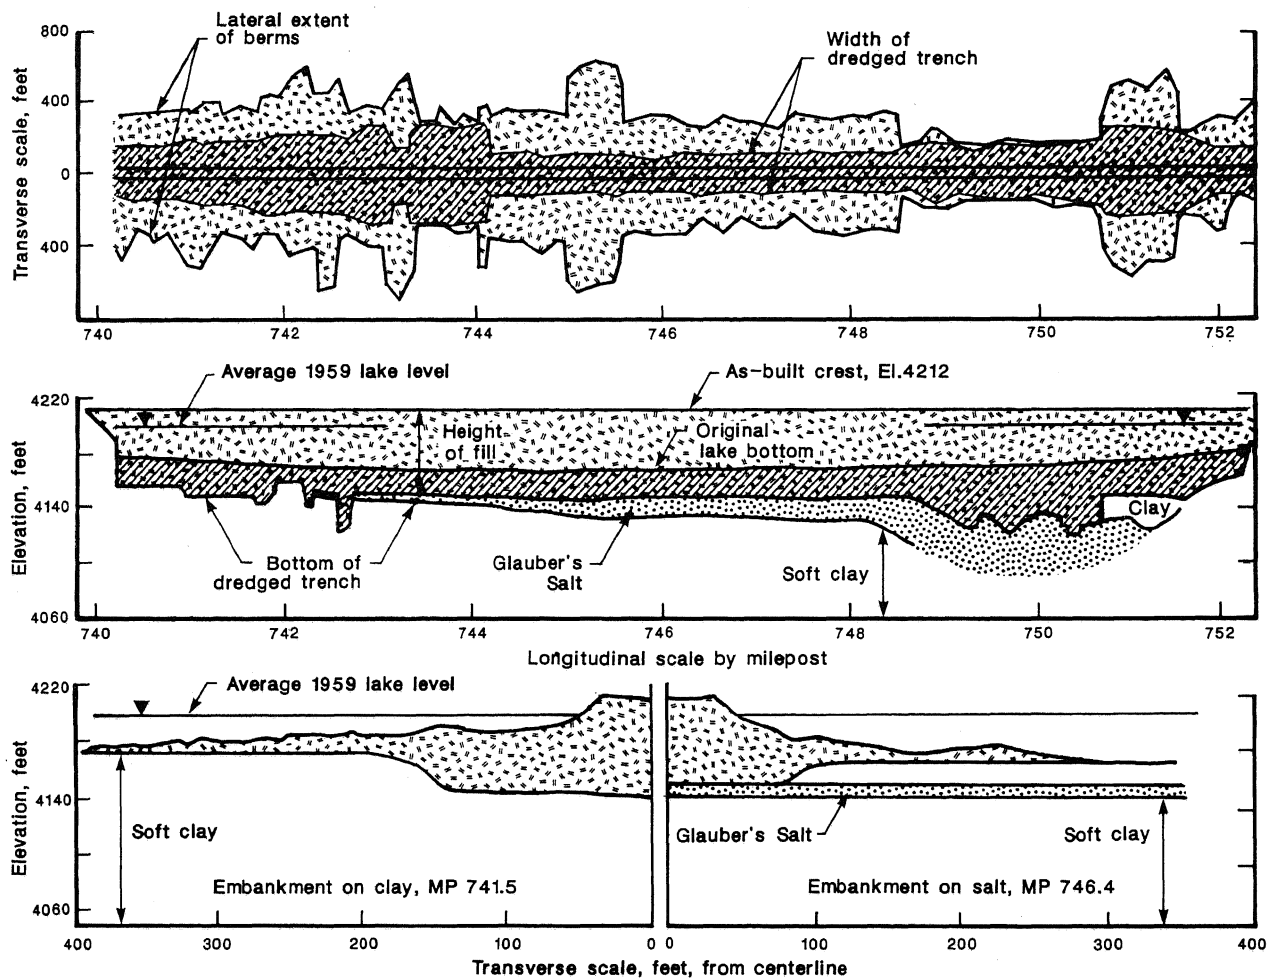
Plan, Profile, and Typical Cross-Sections of Causeway.
